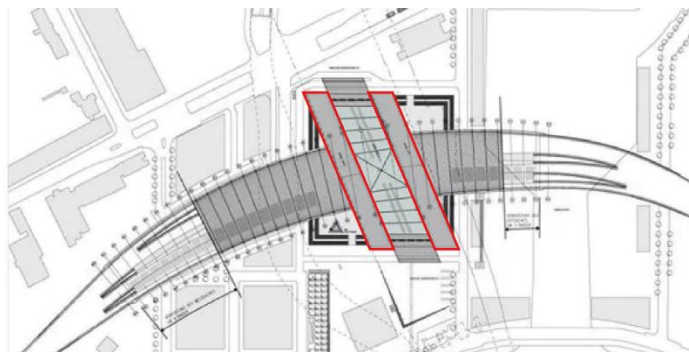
Bridge building at Berlin Central Station , Source: <https://en.wikiarquitectura.com/building/berlin-central-station/>
